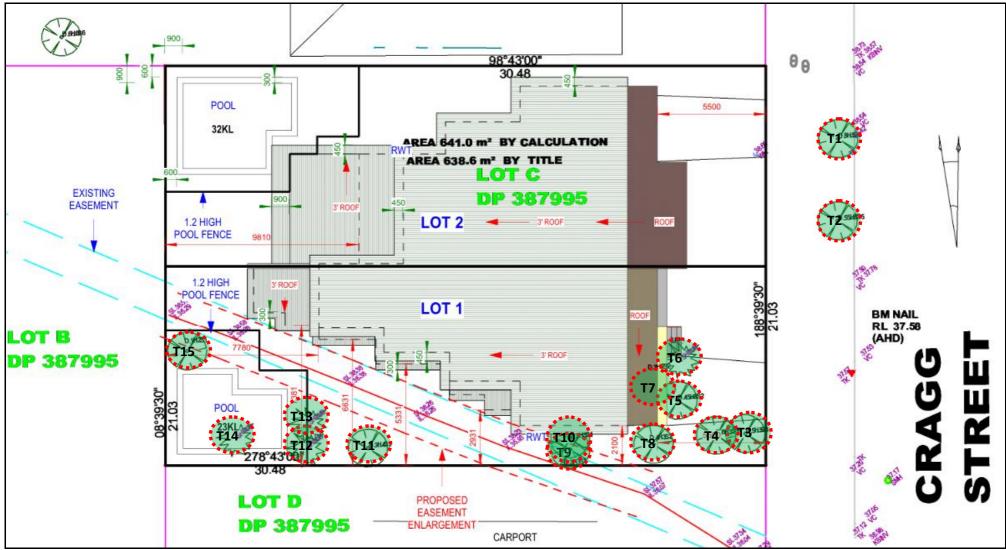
Shows the site and adjoining trees location based on the proposed development layout.
